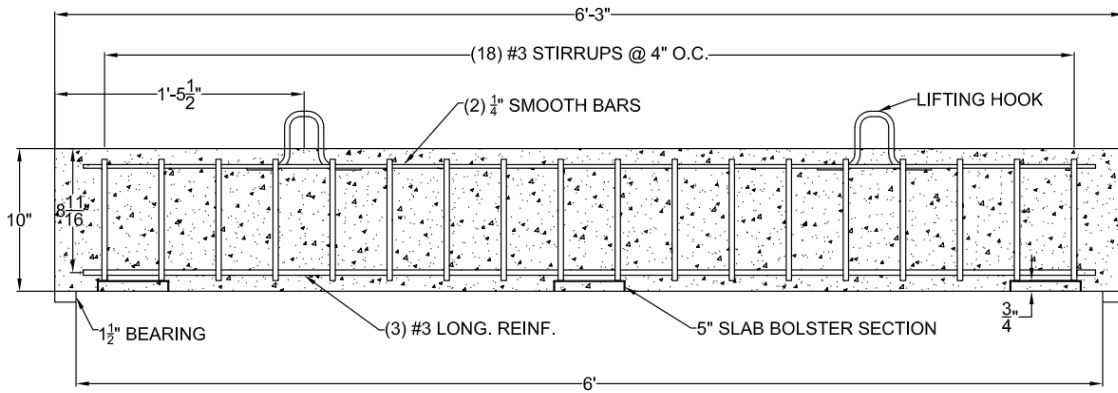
Concrete beam elevation showing the steel reinforcement layout.
